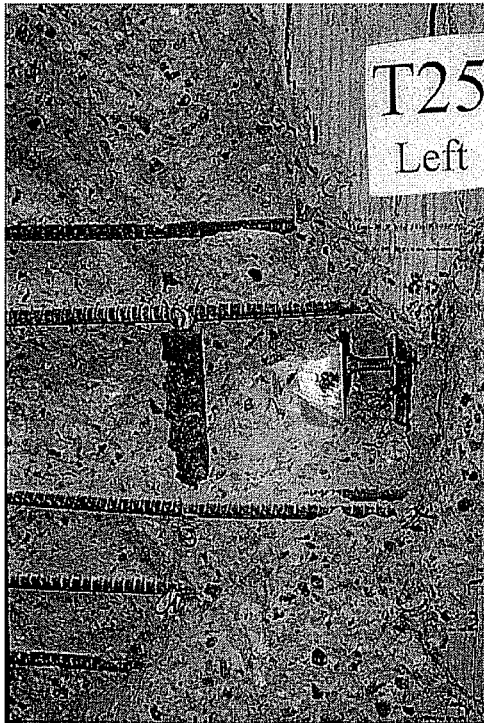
Appearance of specimens with stirrups - Specimen T25
